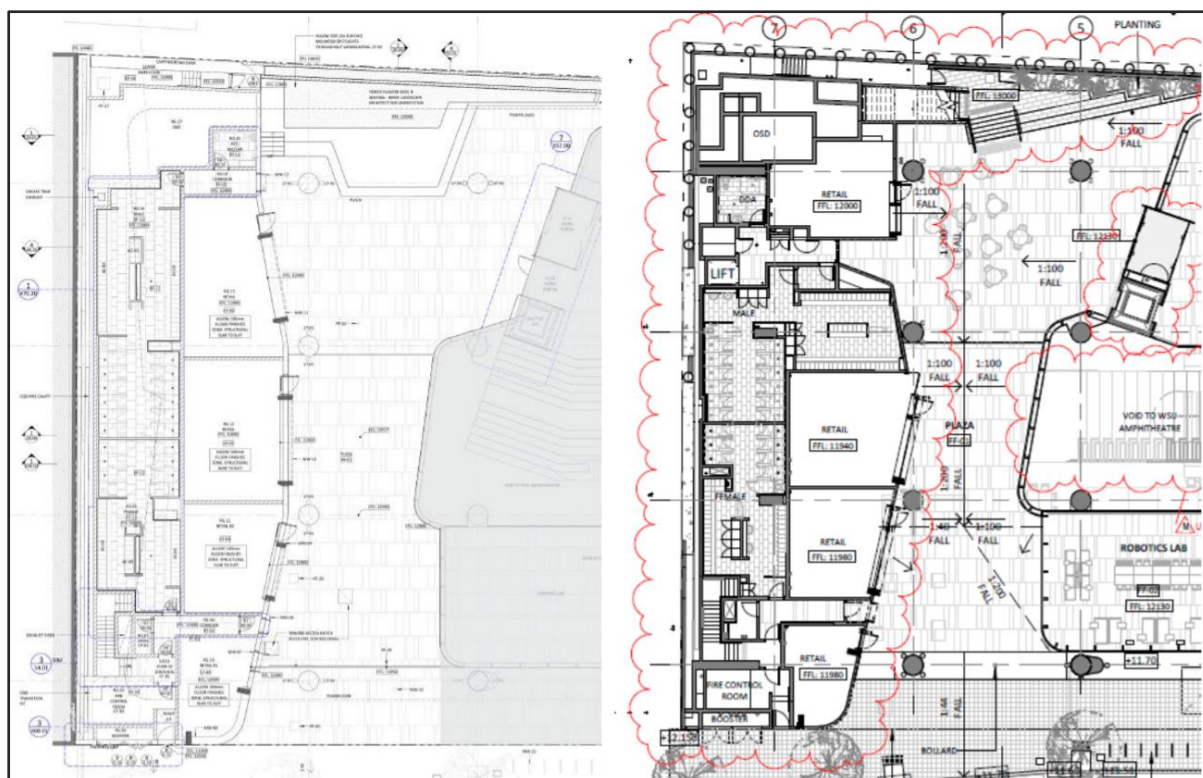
| Approved (Left) and Proposed (Right) Ground Floor Plan (Source: Modification Report)
